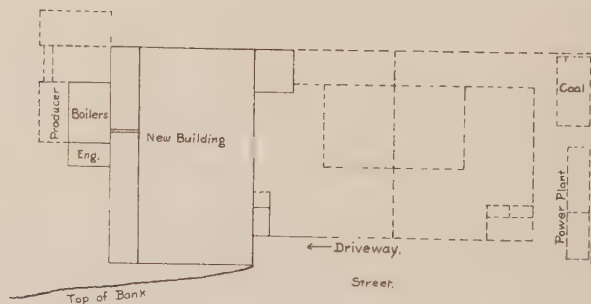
GENERAL PLAN OF THE PROPERTY.
